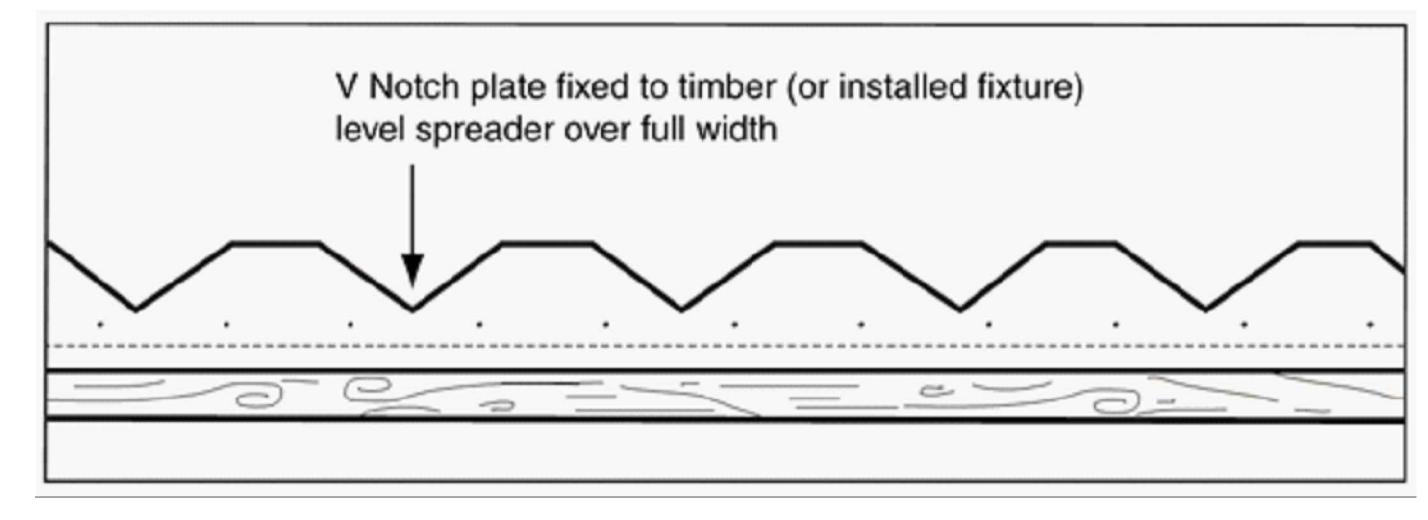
TYPICAL DETAIL FOR MULTIPLE V-NOTCH WEIR PLATE
